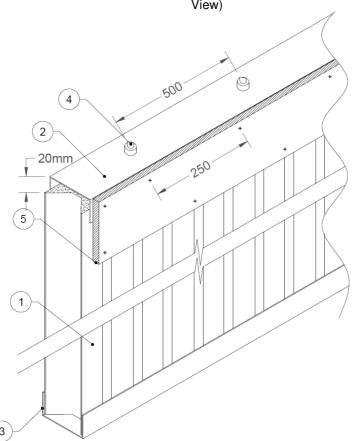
Head Detail E – Protected by One layer of PROMATEC® 100 Board on One Side
